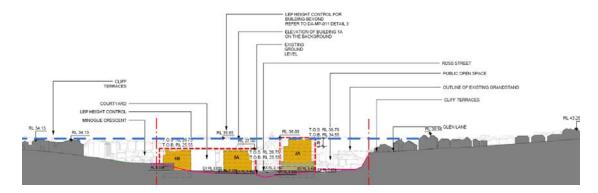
Proposed site section showing the proposed building's relationship with surrounding properties.
